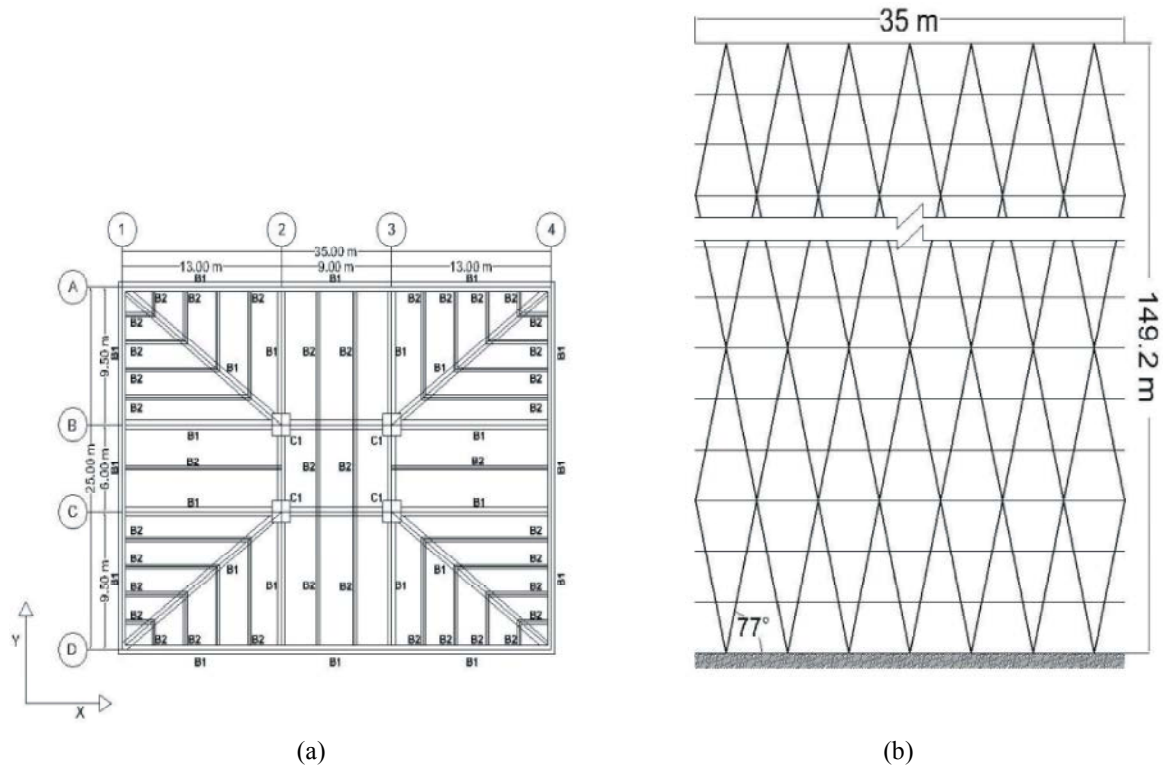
Typical (a) Rectangular Floor Plan[7] and (b) Elevation of 43-storey Buildings
